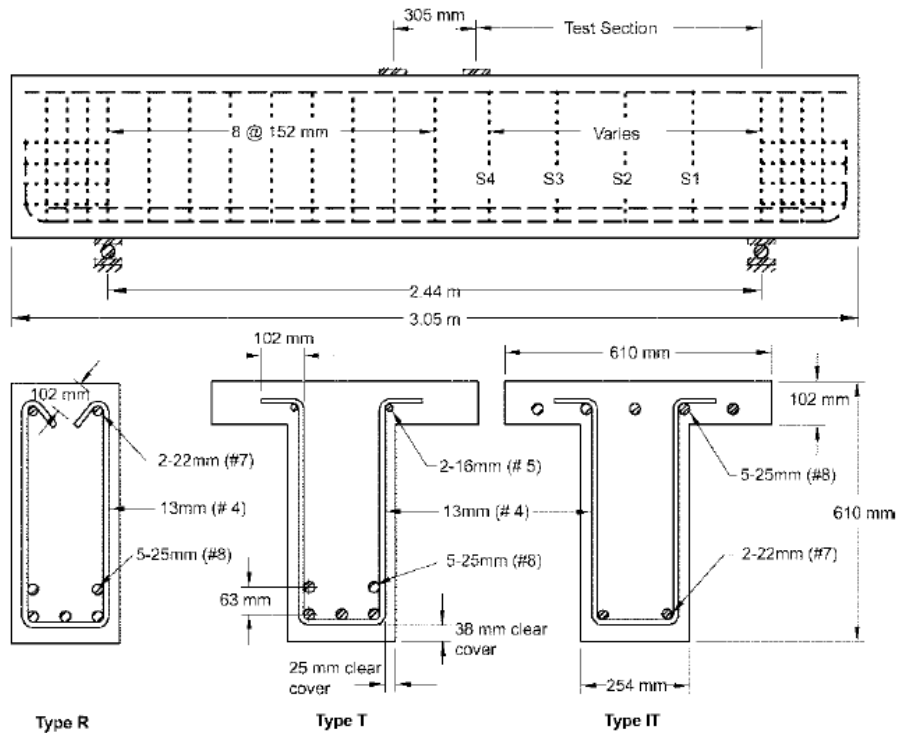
Details of specimens (Higgins and Farrow, 2006)
